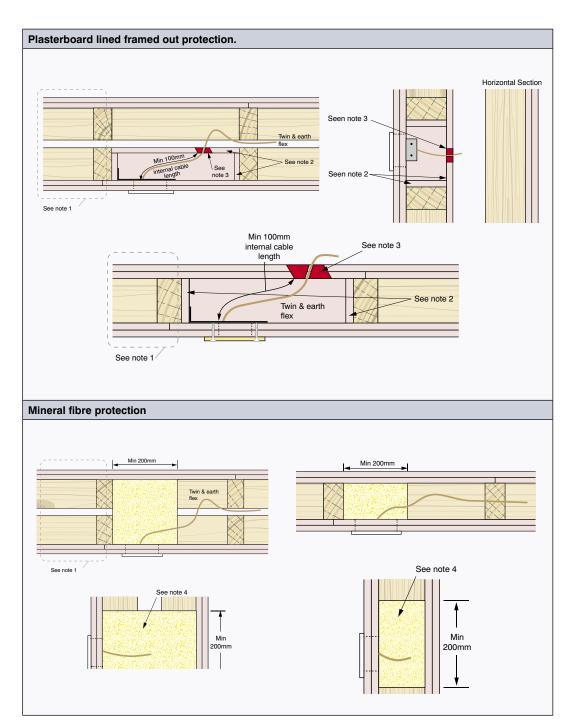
Generic GPO protection systems in timber-framed construction.
